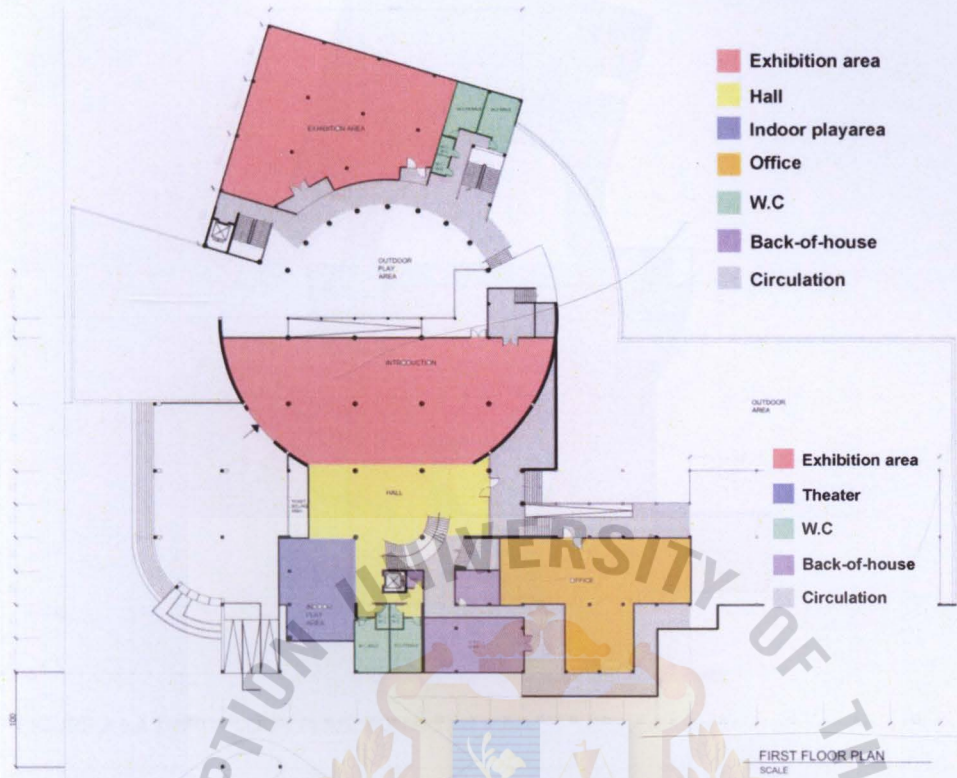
FIRST FLOOR PLAN: ZONING
